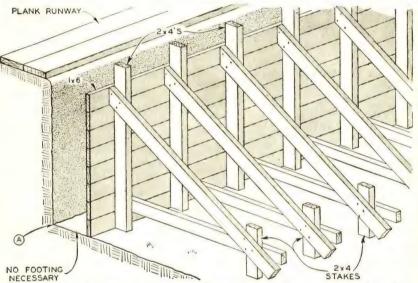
Formwork for Foundation Where the Excavation Side Serves As the Outer Form
